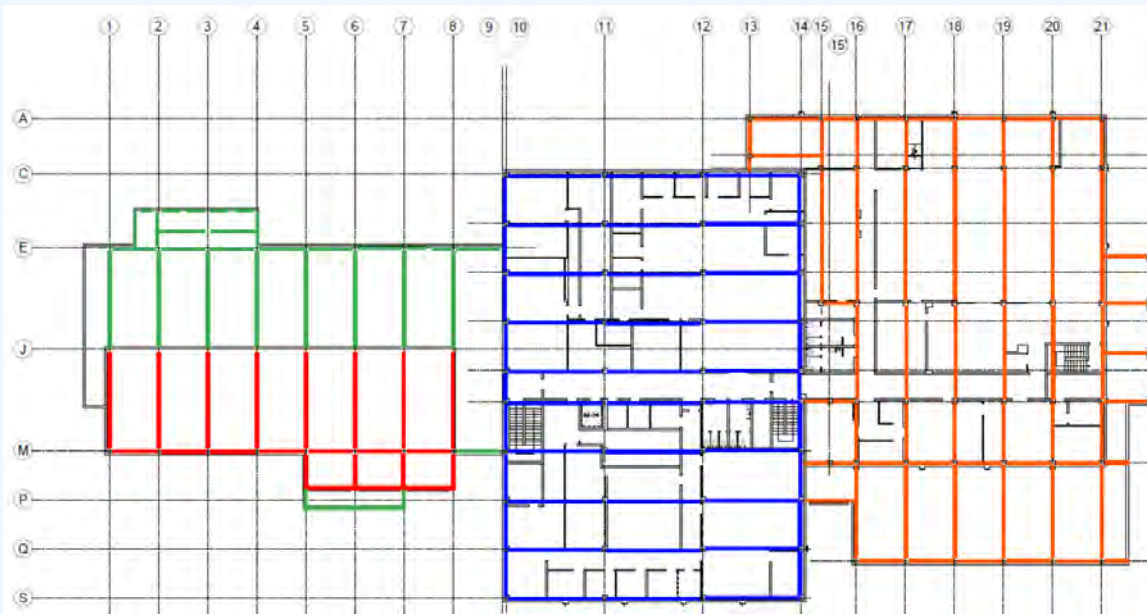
All colored lines shown indicate beams/girders. The green and red lines support segment #1's roof. The blue lines support segment #2's second floor. The orange lines support segment #3's second floor and roof of segment #3's laboratories.
